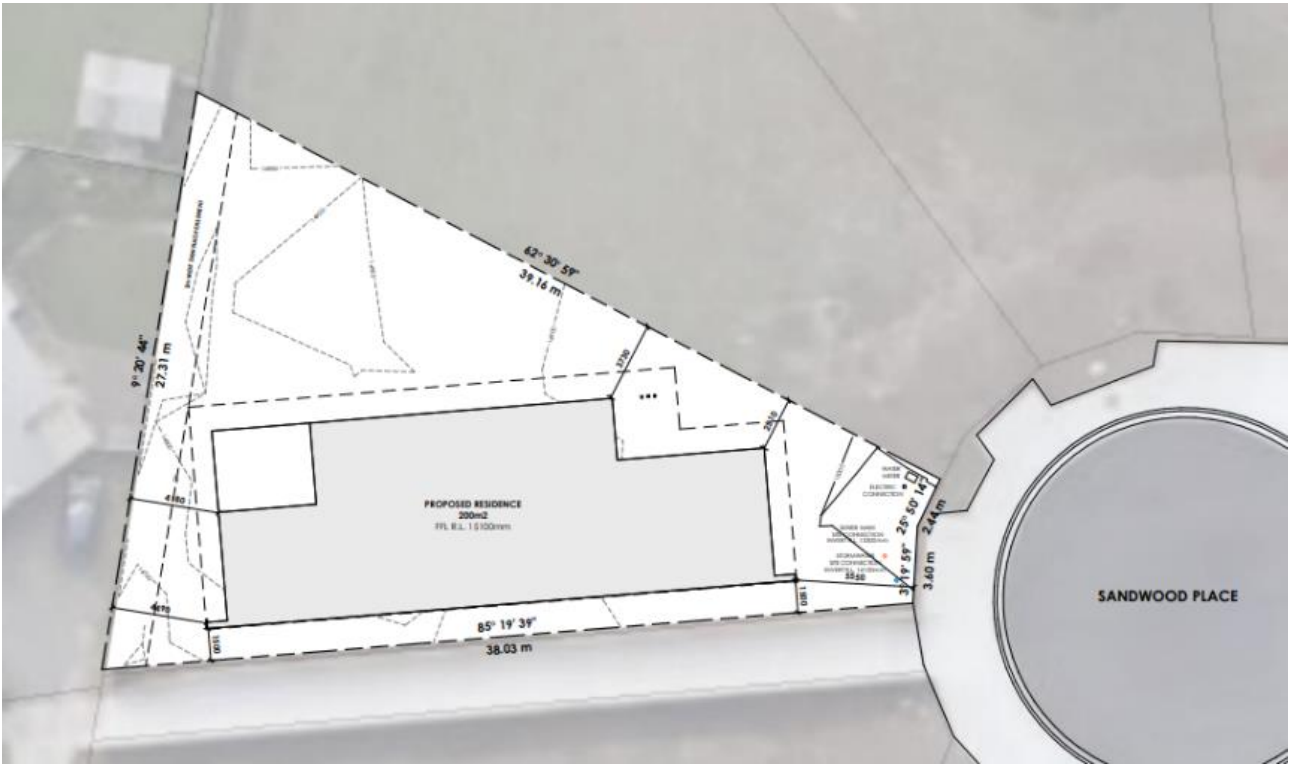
Site plan of dwelling: #12 Sandwood Place (n + b)
